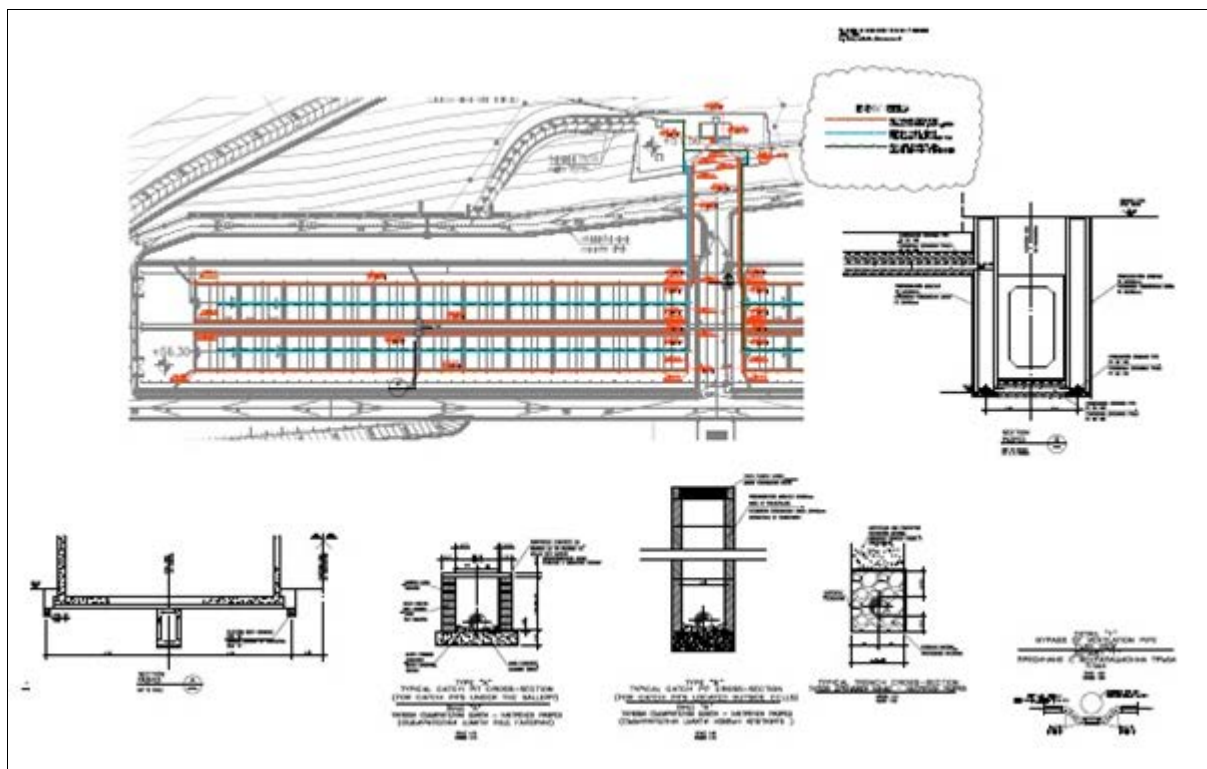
PIPE NETWORK FOR COLLECTING DEEP DRAINAGES FROM PLATFORM 1
